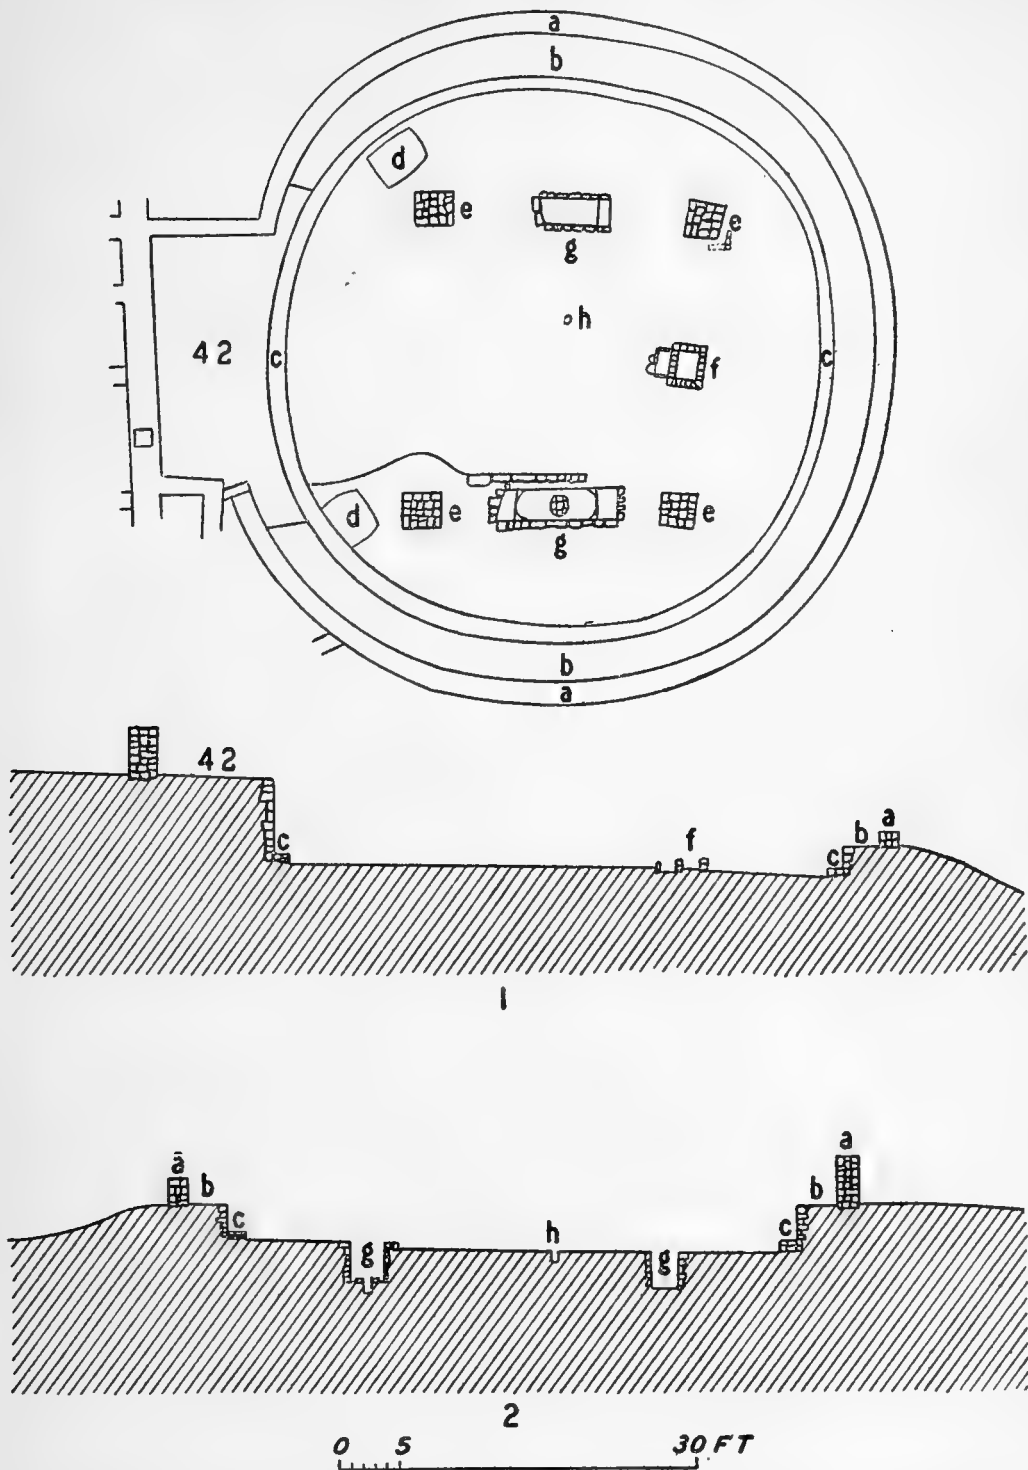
Plan and sections of Great Kiva No. 1. *a*, Outer walls; *b*, upper bench; *c*, lower bench; *d*, holes in floor; *e*, support pillars; *f*, fire pit; *g*, subfloor vaults; *h*, sipapu
